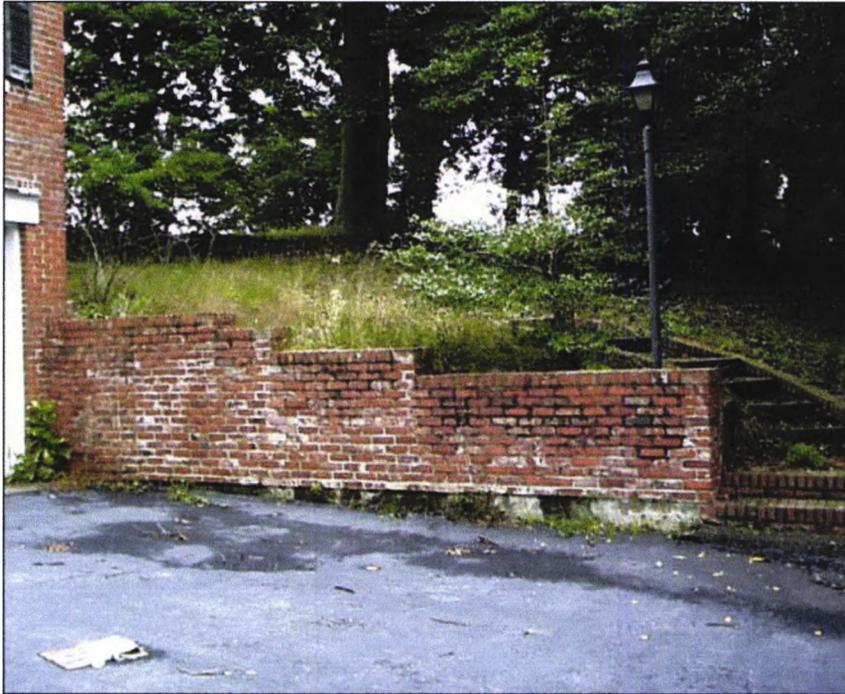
Brick retaining wall at edge of driveway (COLO 2001).
